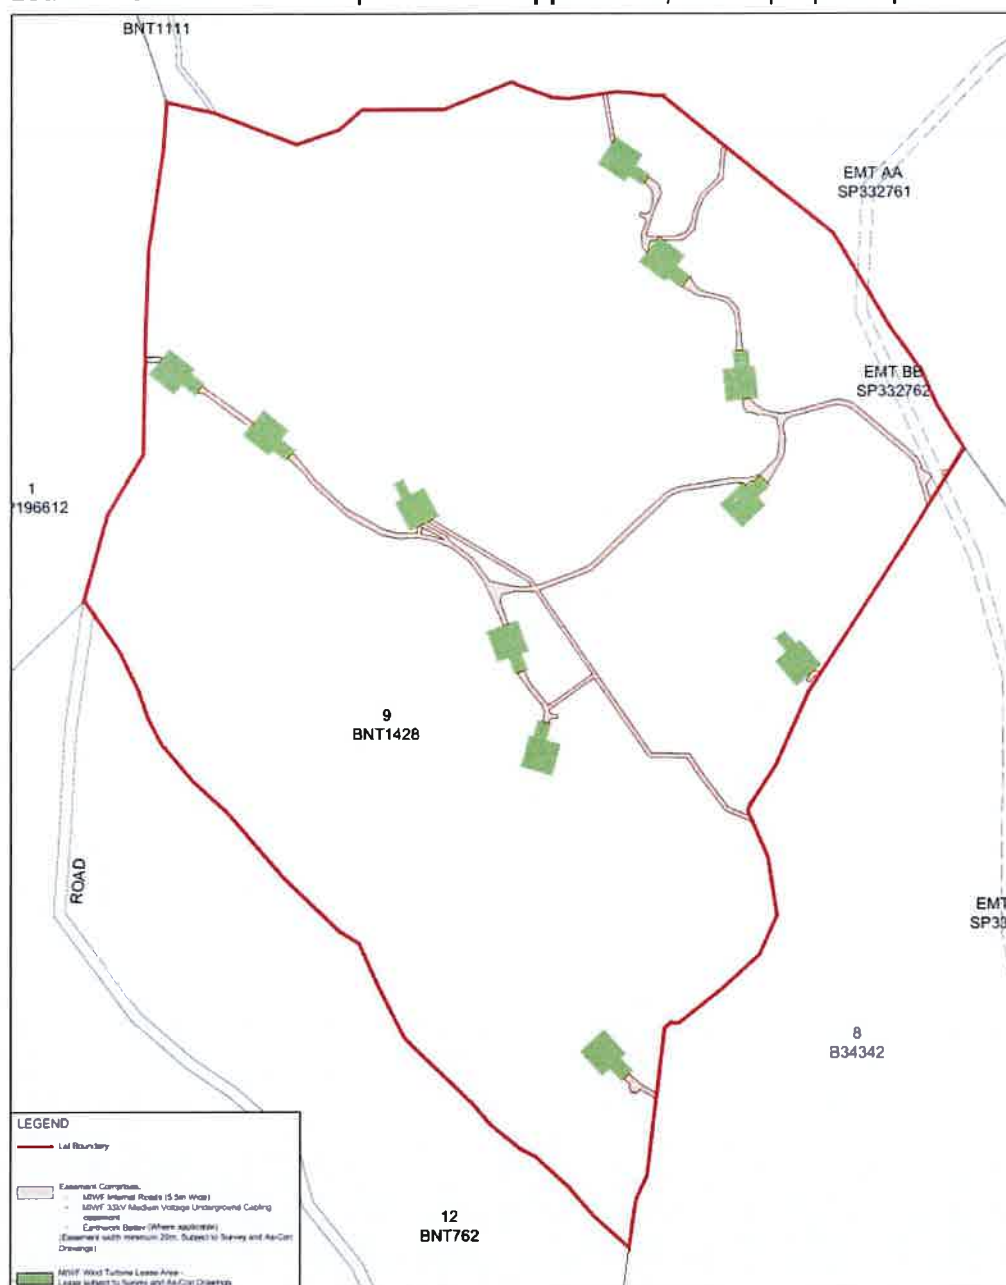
Concept Lease and Easement Plan Extract (Source: Saunders Havill)
